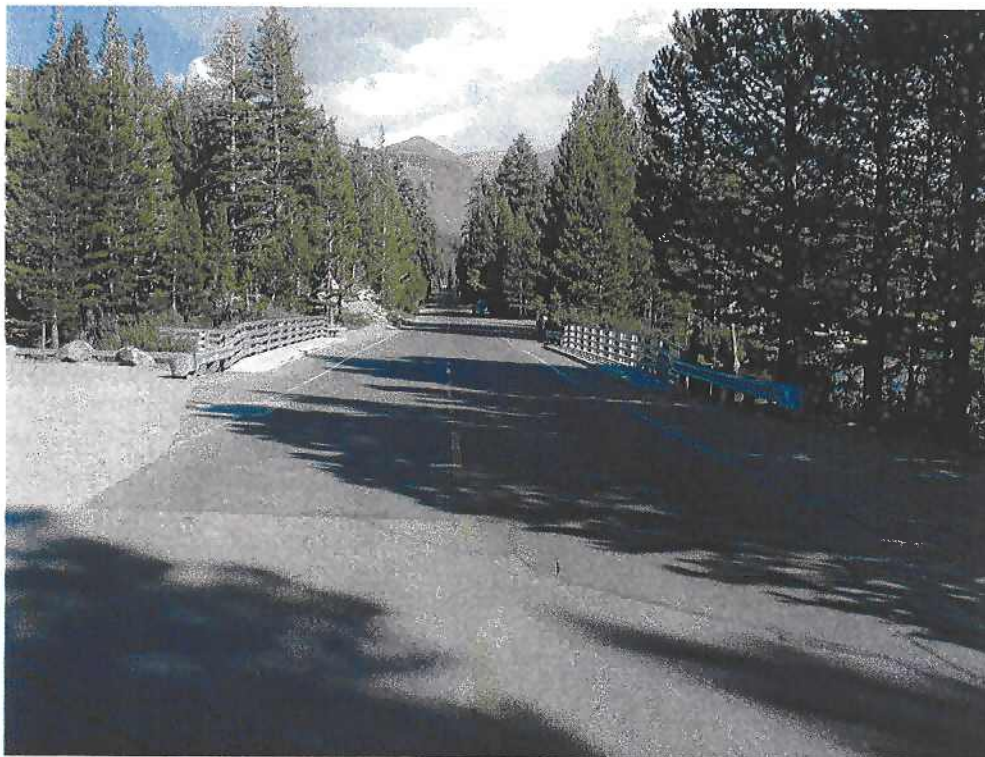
(MM 0.1-0.4): Moderate to high edge cracking and EOP failure.
